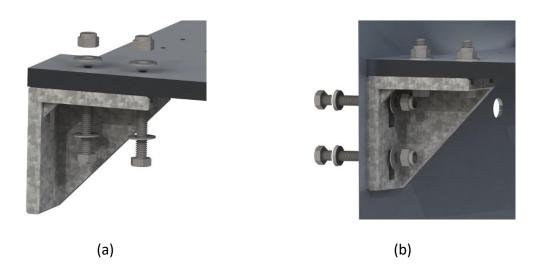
Wall bracket attachment to (a) support plate and (b) wall [13].
